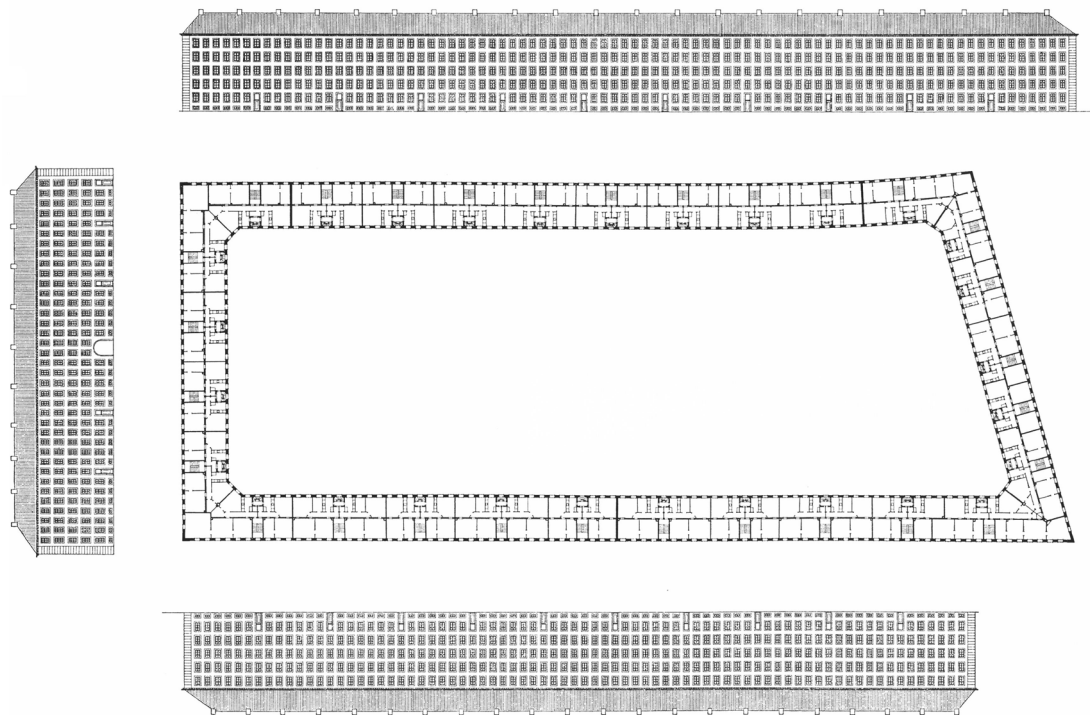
Kay Fisker, Hornbækhus, plan type and building elevations, (1920-1923), Copenhagen
